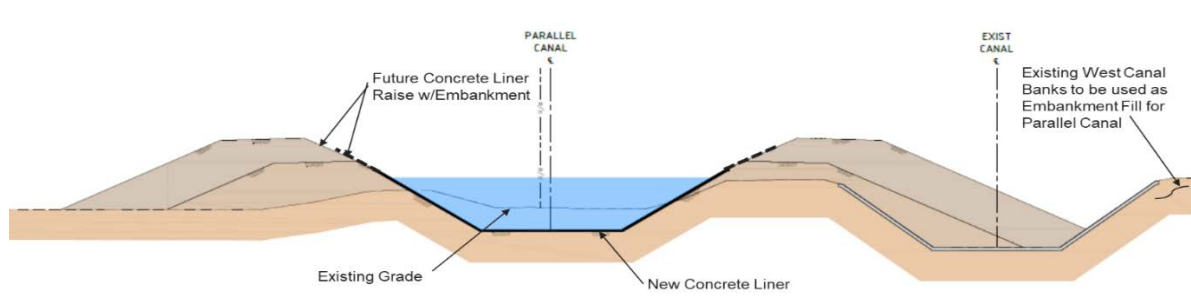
Trapezoidal Cross Section in the Parallel Canal Alternative
